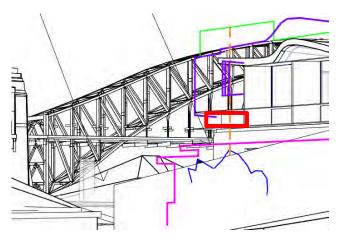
Proposed view through right-hand south-east facing window of Unit 14/21 Waiwera Street
